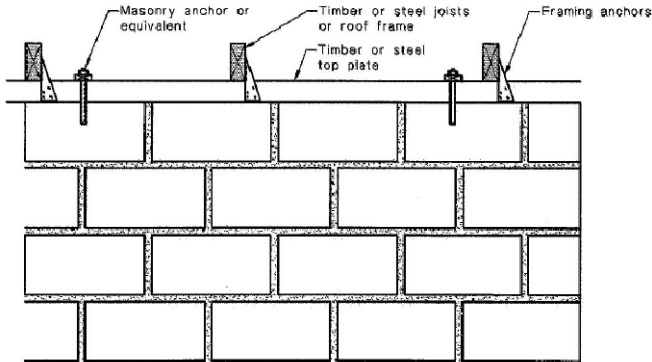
DETAILS OF TOP SUPPORT T5—TIMBER OR STEEL FRAMING
